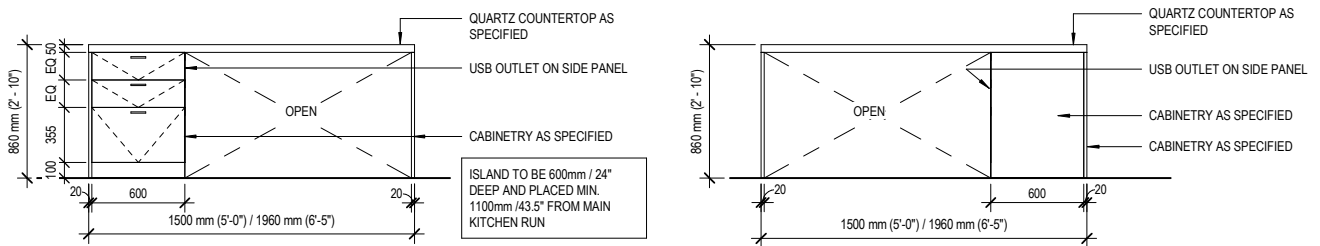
Typical Kitchen Island Front & Back Elevations
